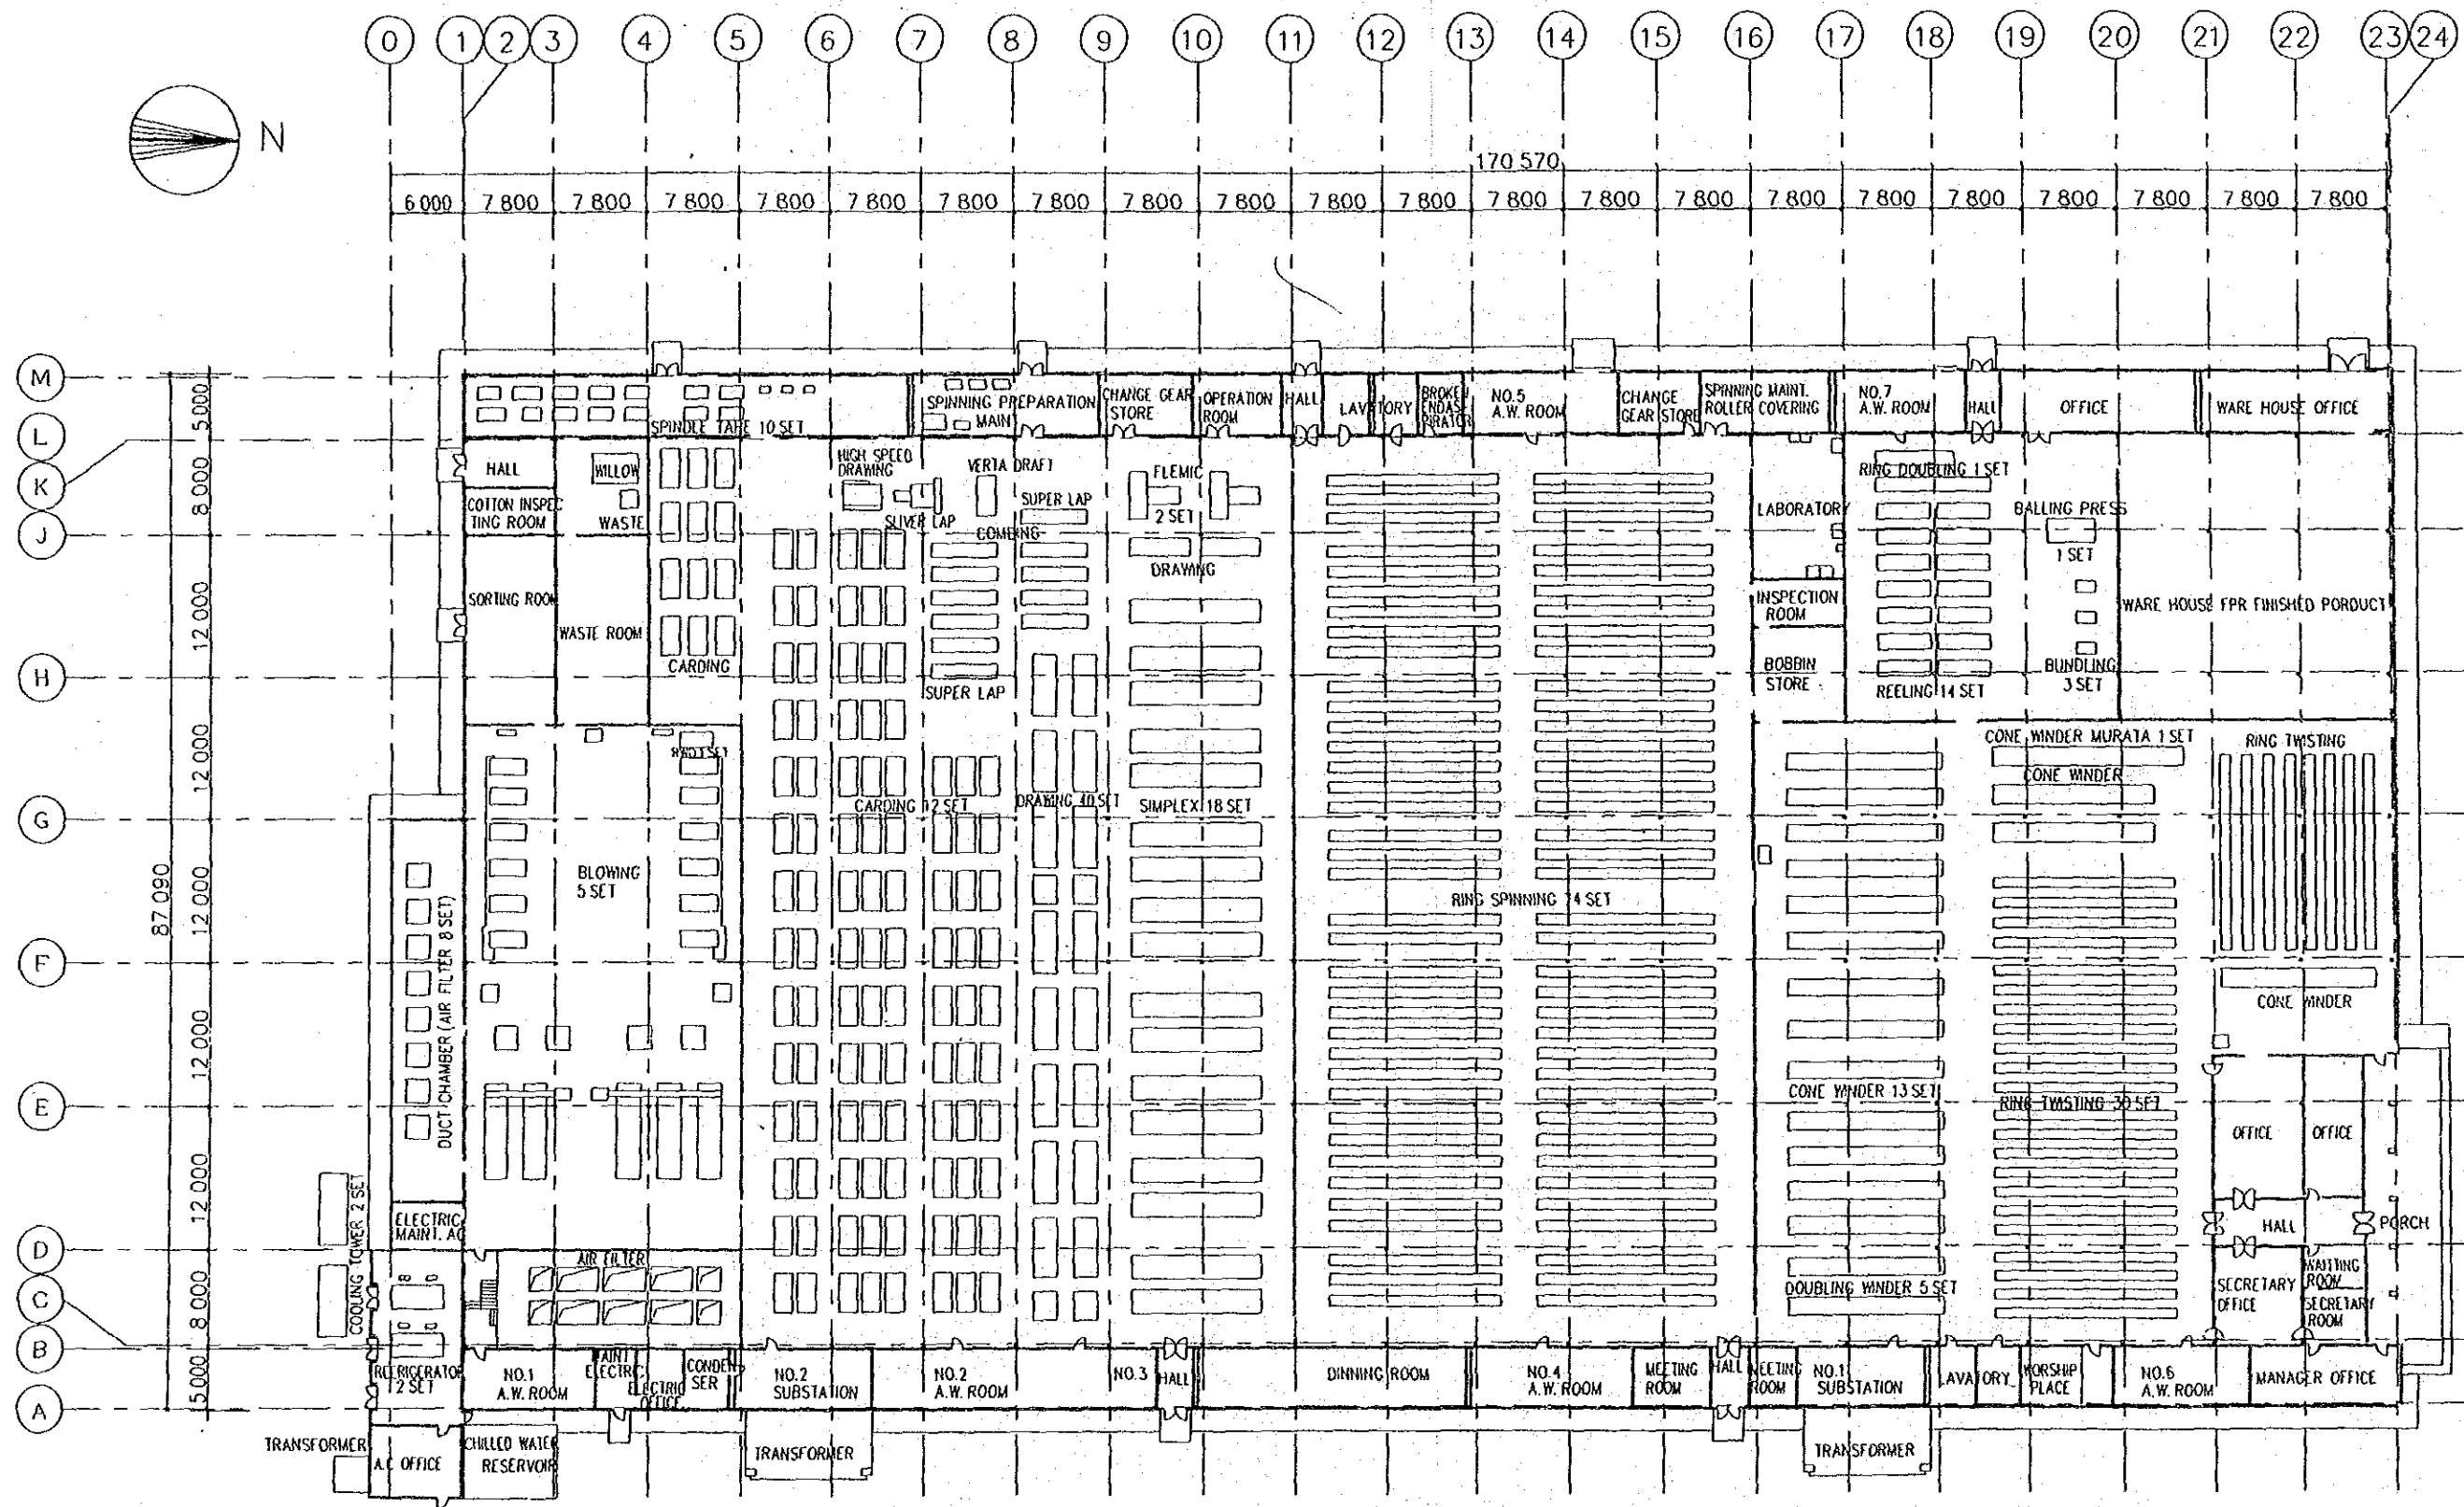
Layout of Production Machinery : Banjaran First Mill
